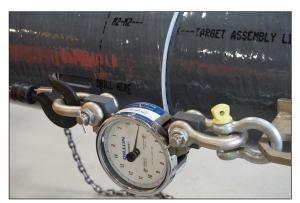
Completed Slip Joint Assembled to 4,000 lb. [1,814 kg] of Force
